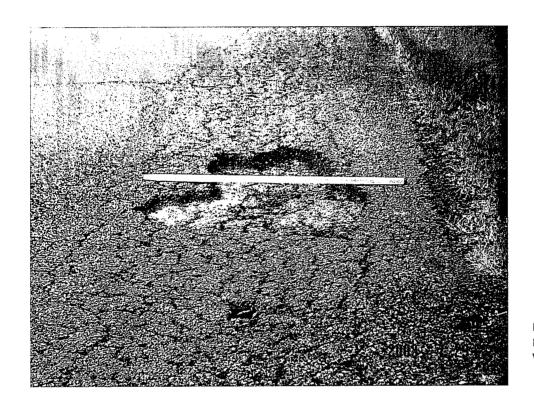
High Severity Fatigue Cracking with Small Pothole in Wheel Path
